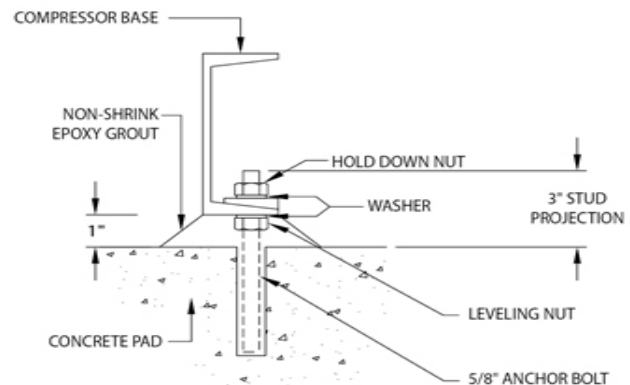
Concrete Pad and Compressor Unit Installation Detail
